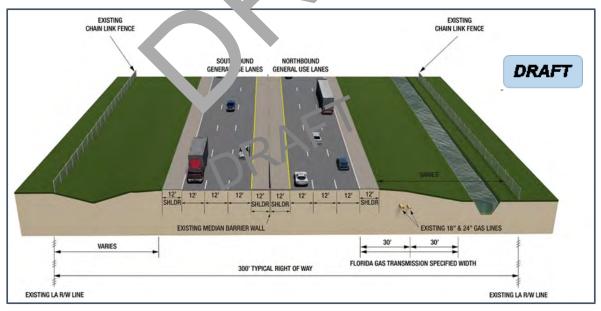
Existing Typical Section (Atlantic Boulevard to Wiles Road)
